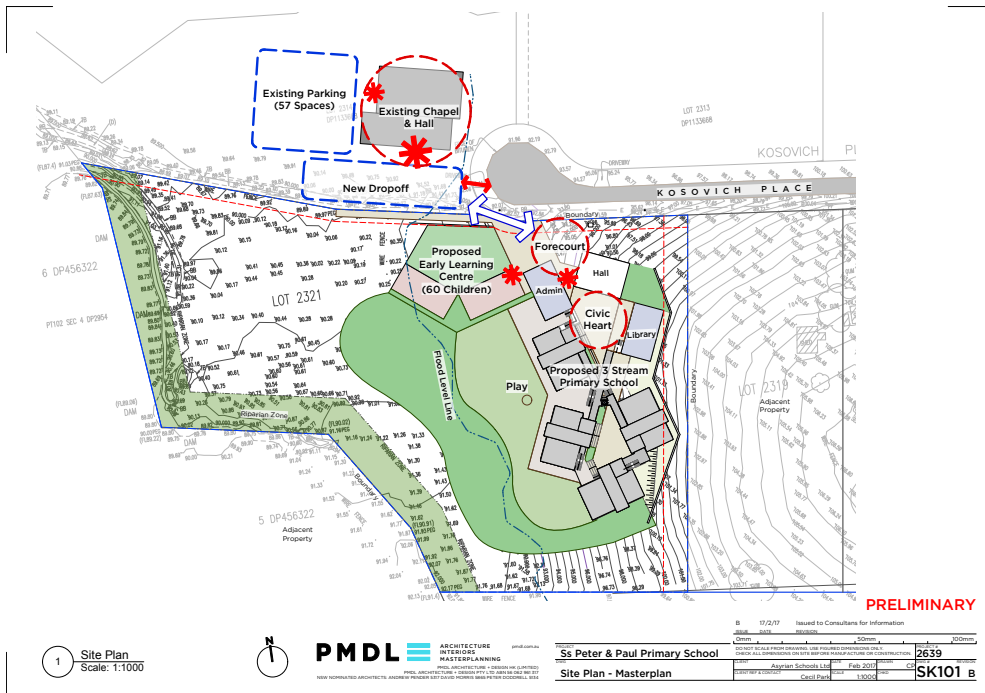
SK101B - Site Plan - 23/2/2017
